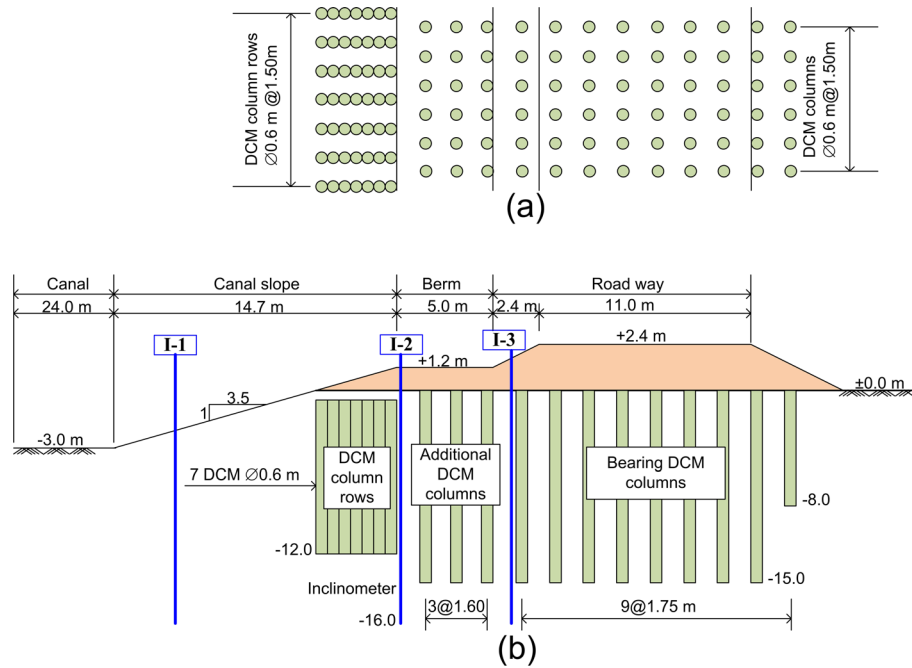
Configuration of drainage canal stabilized with DCM columns: a plan view and b section view
